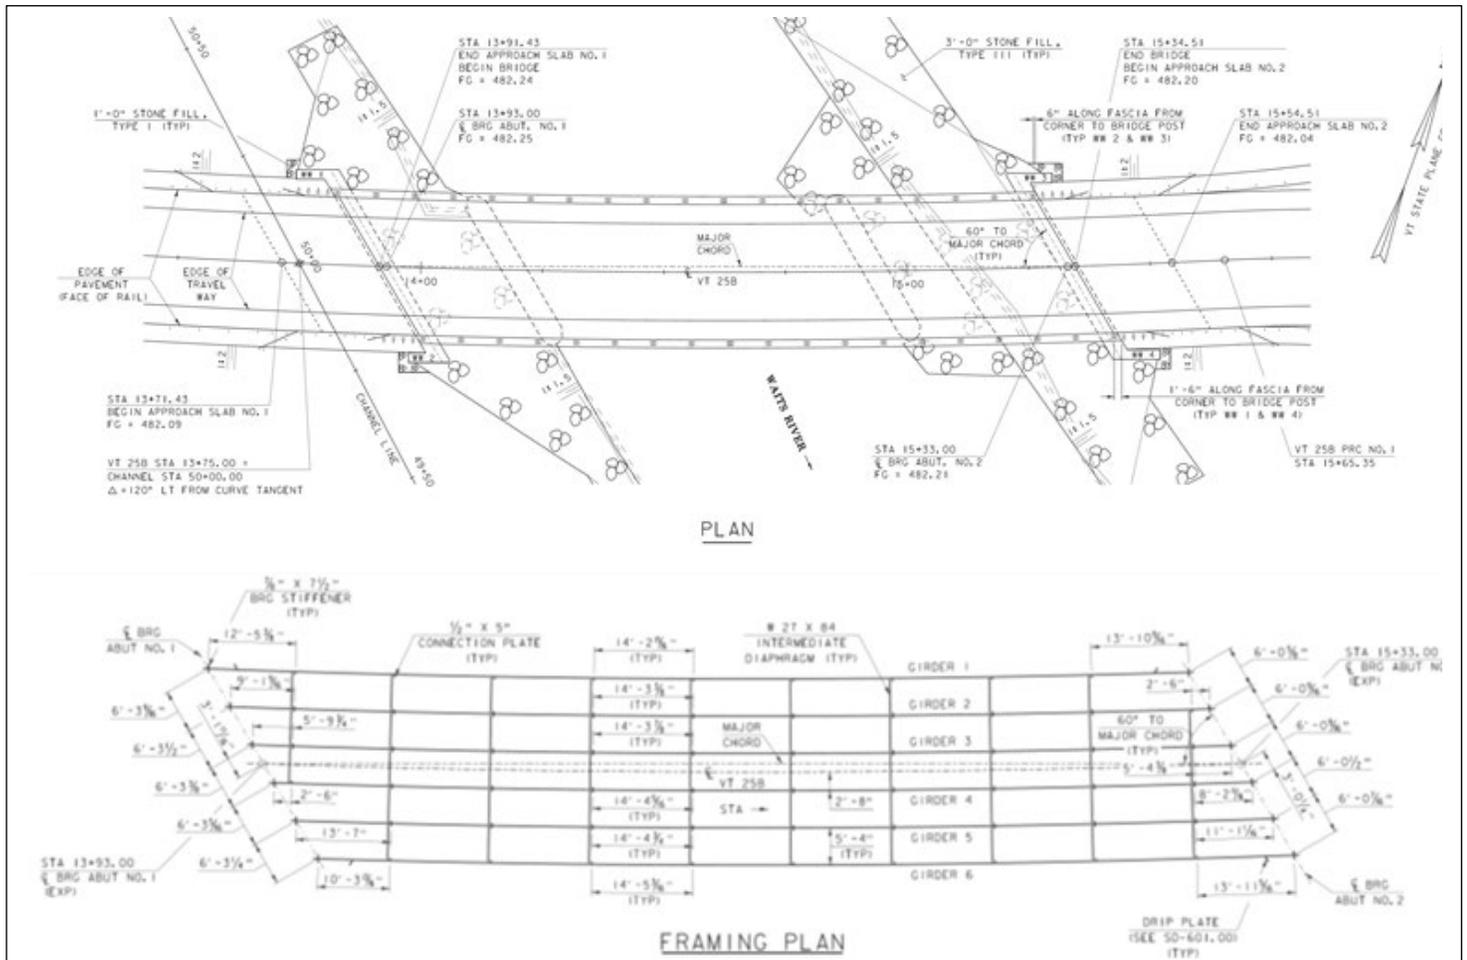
Plan Views of Bradford Bridge (VTrans - Used by Permission)
